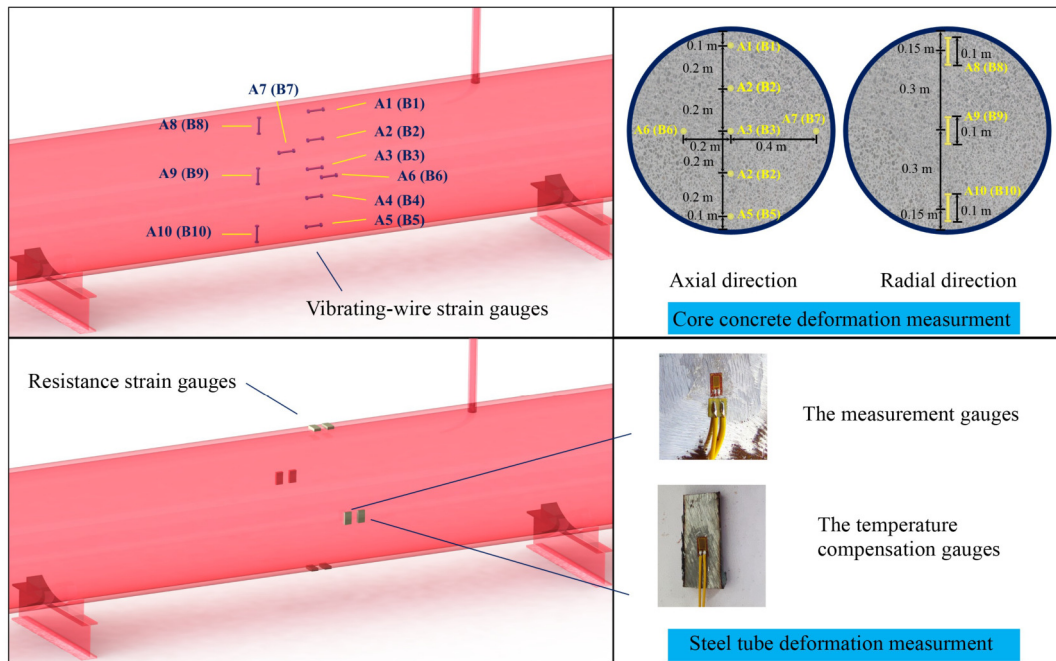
Deformation measurement arrangements of core concrete and steel tube.
